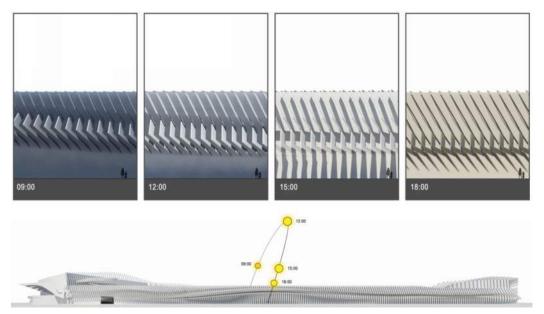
Early Façade Concept Indicating Shading Benefit of Proposed Design (Image courtesy of Fentress Architects and Arquitectonica)
